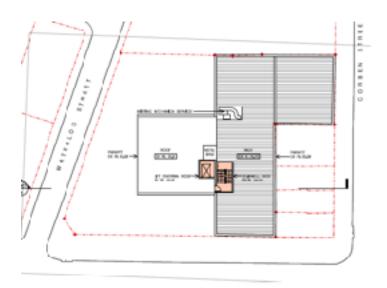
The site plan showing the off-sett cruciform shape of the building.
